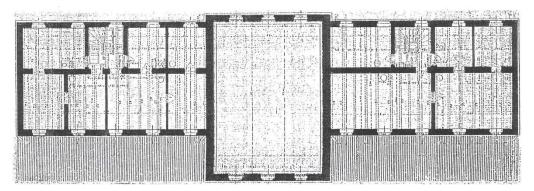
Ist class station building project drawn for Ankara-Eskişehir/ First floor plan. (Source: Araz, 1995)
